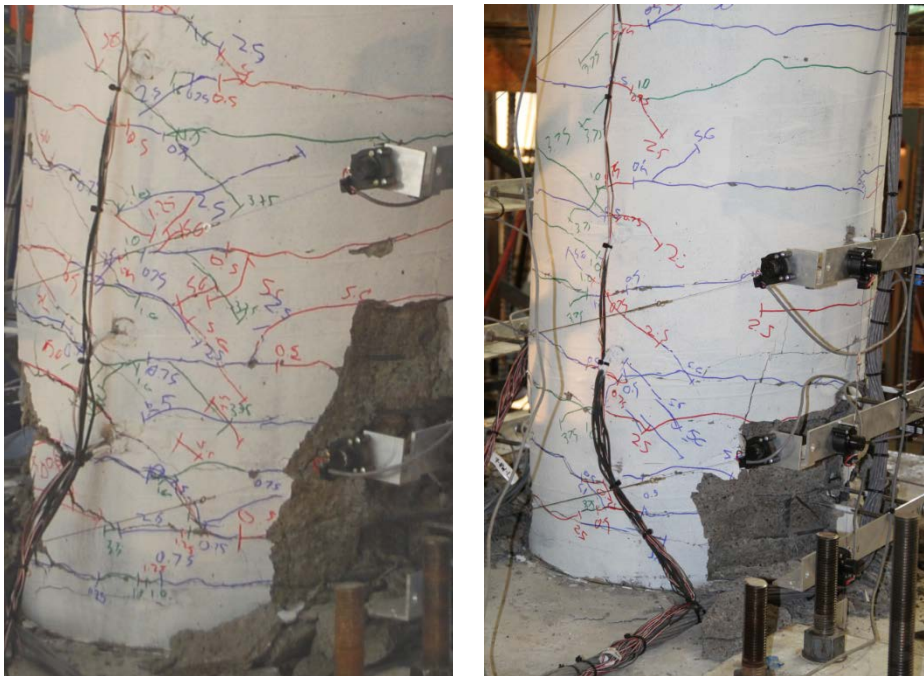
Photographs of column C3 (left) and C4 (right) cracking
